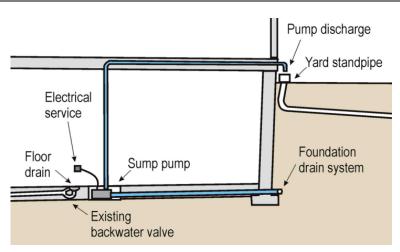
Foundation Drain Disconnection Setup in Duluth, MN
